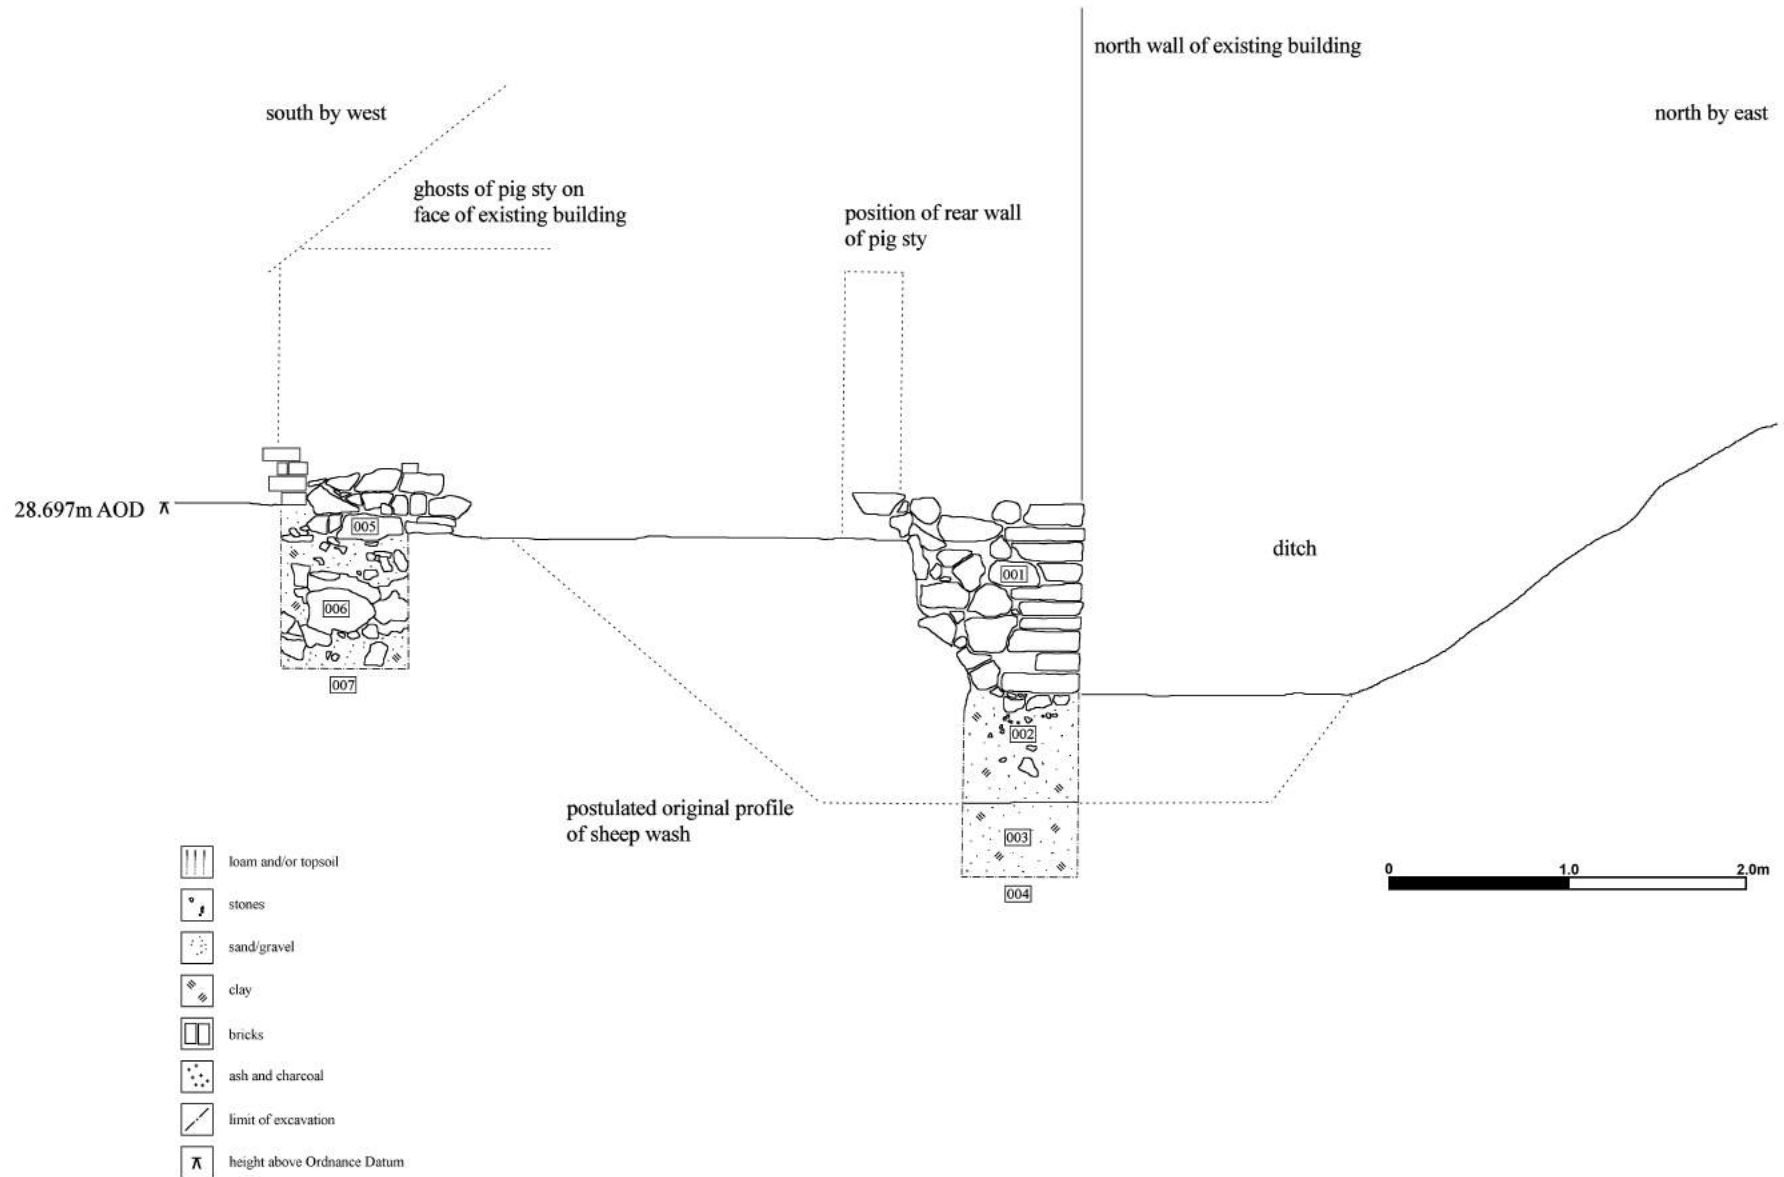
Sections through footings of extension and profile of adjacent ditch
